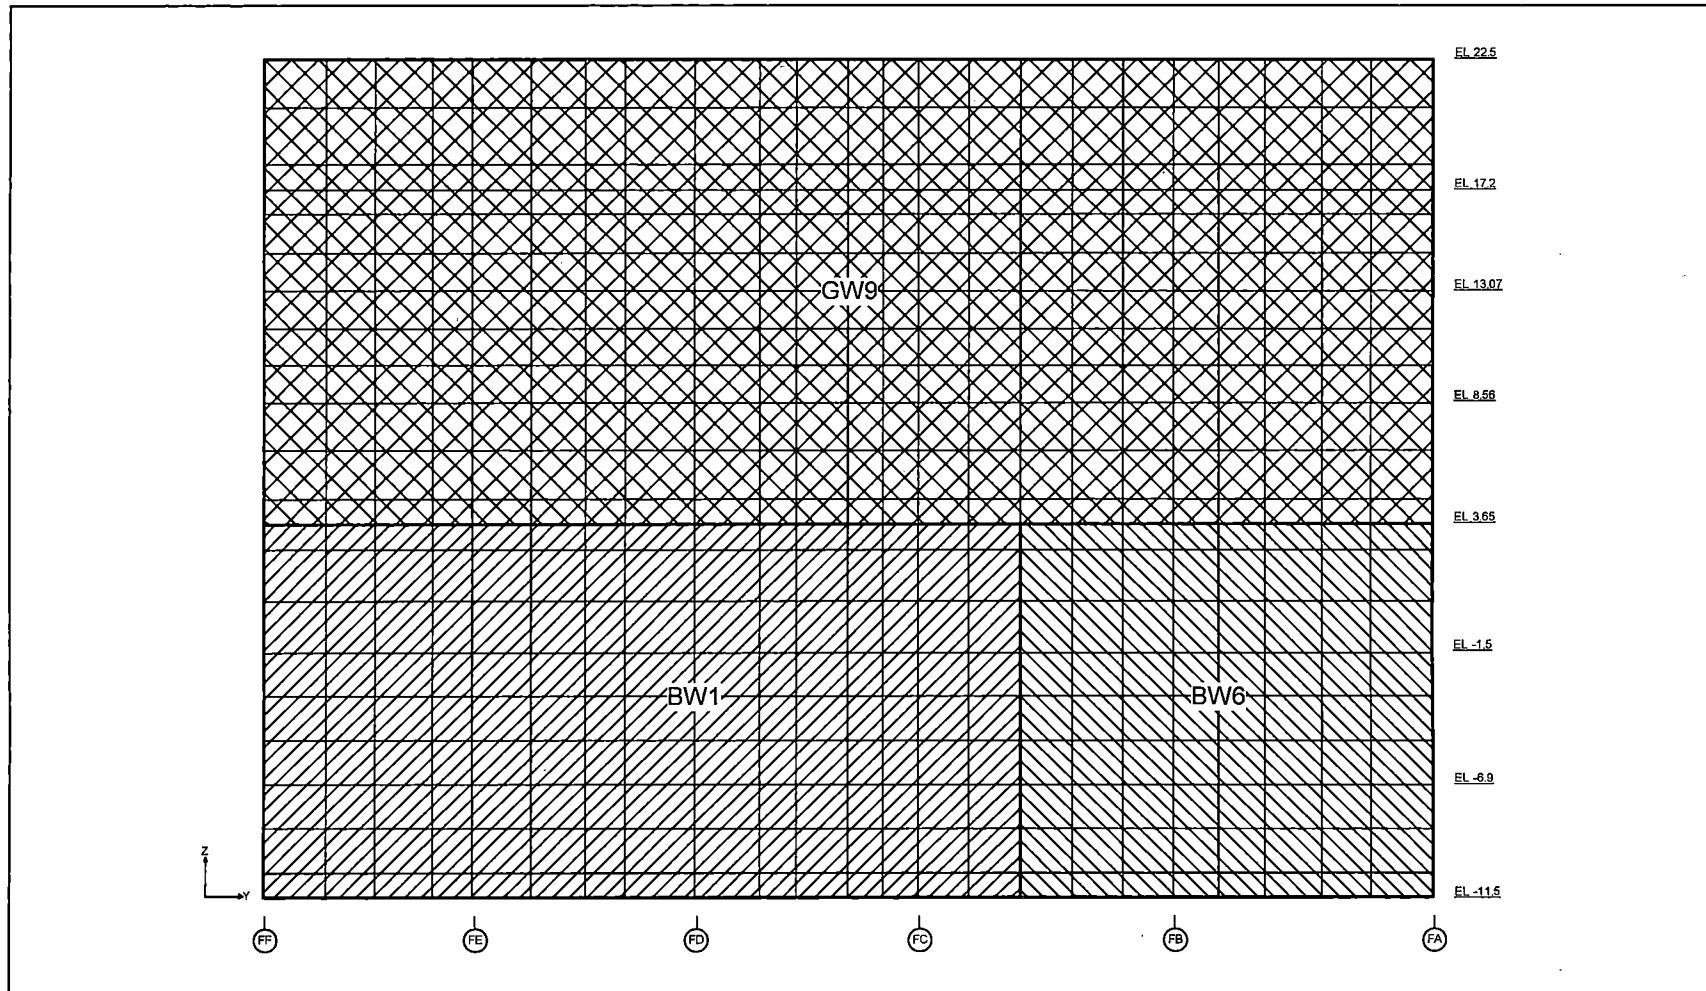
Application of Thermal Load on the External Wall (F3)
